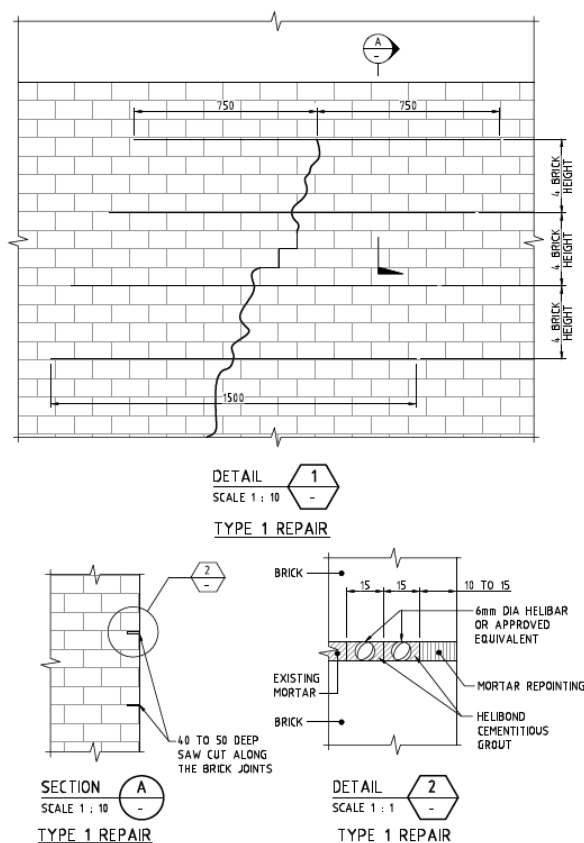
Areas of brickwork requiring crack-stitching (SMEC).
